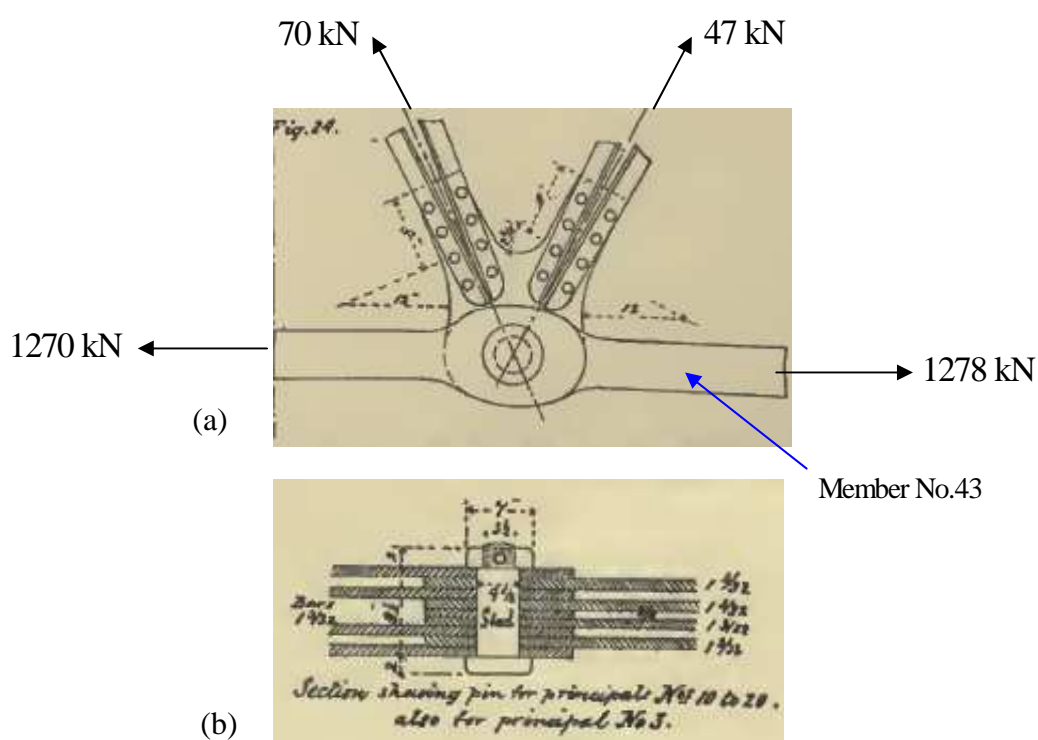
(a) Elevation and (b) plan view of bottom chord eye-bar connection in Liverpool Lime Street Station roof truss, labelled as Detail A in Figure 8.21. Case 2 loading (i.e. 15kN/m). (Walmisley 1888)
